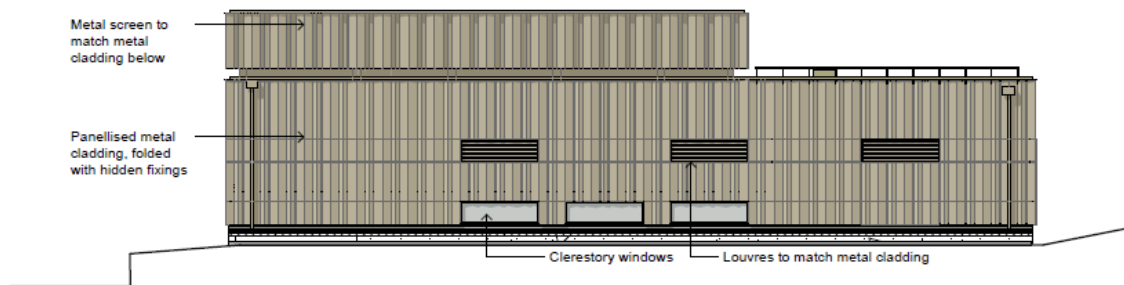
North Elevation of the Ballantrae Place Building (source: Studio Pacific Architecture)
